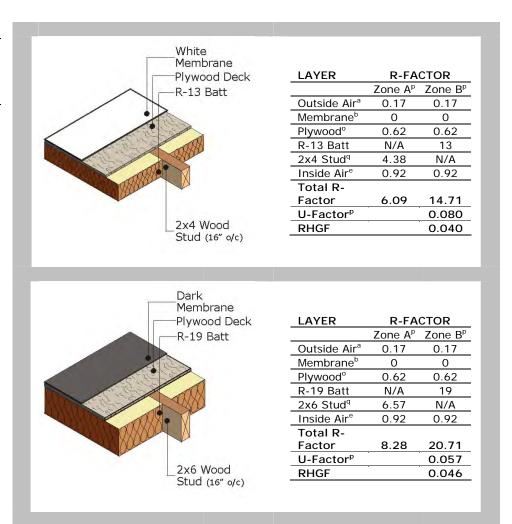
(cont'd.) Low-slope plywood deck roof assembly
